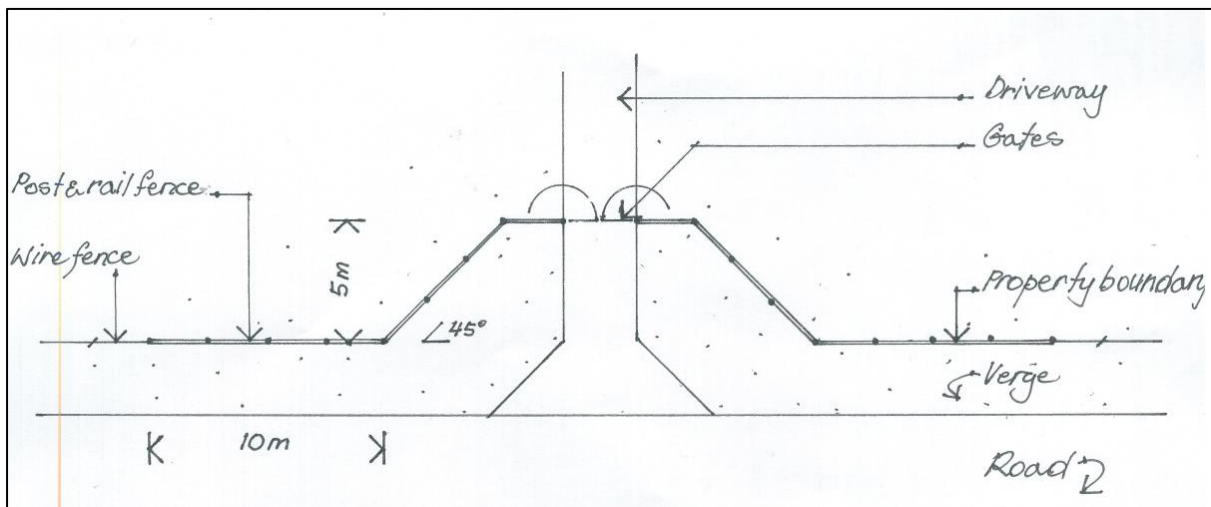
Example of layout of fencing and driveway gate inset
